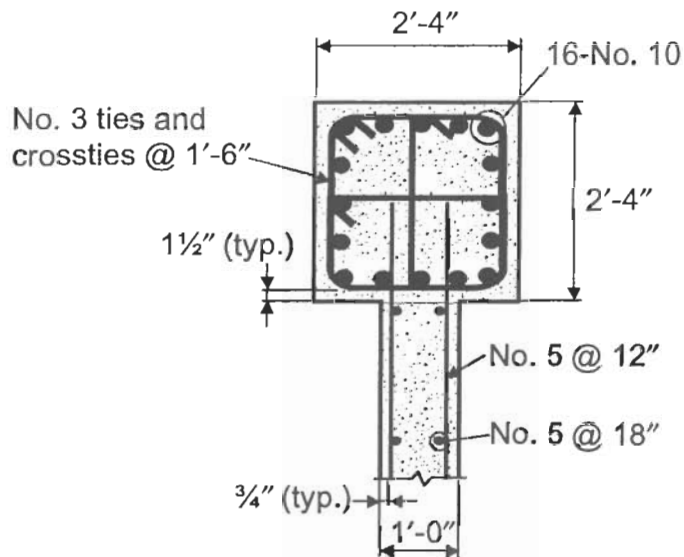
Reinforcement Details for Shear Wall Along Line 7 (SDC A)
